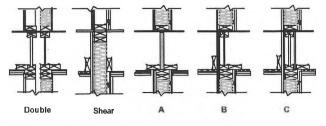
Sketches showing the floor-wall junction details for five variants of the double and single stud walls.
